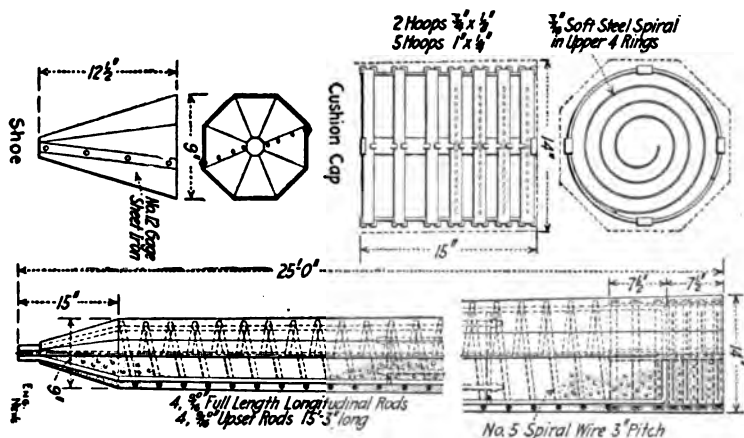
DESIGN OF REINFORCED CONCRETE PILE.
